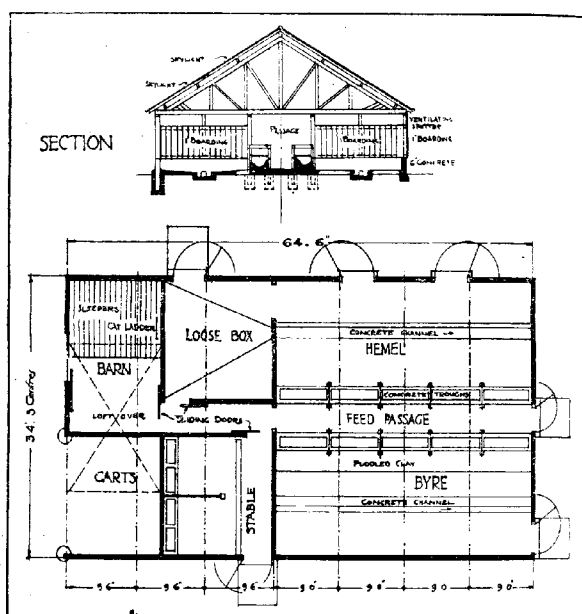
Plan and Section of Farm Building at Hexhamshire, Northumberland.
